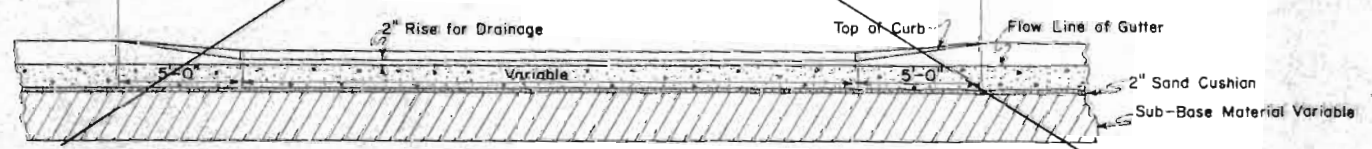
DETAILS SHOWING CONCRETE ALLEY ENTRANCE
